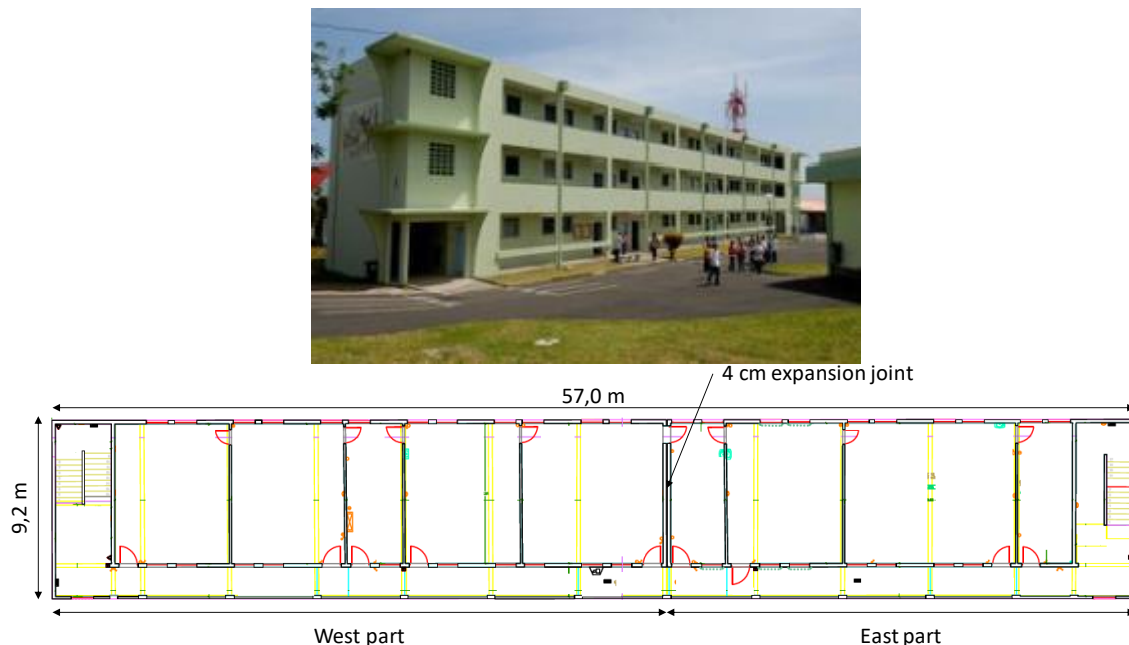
Overview of the building (at the top) and the first floor plan view (at the bottom)
